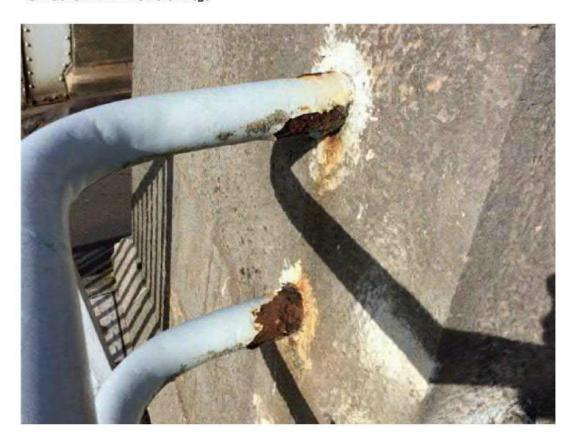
Handrall / parapets / safety fences - paint loss and corrosion to inner parapet to east side of south tower
